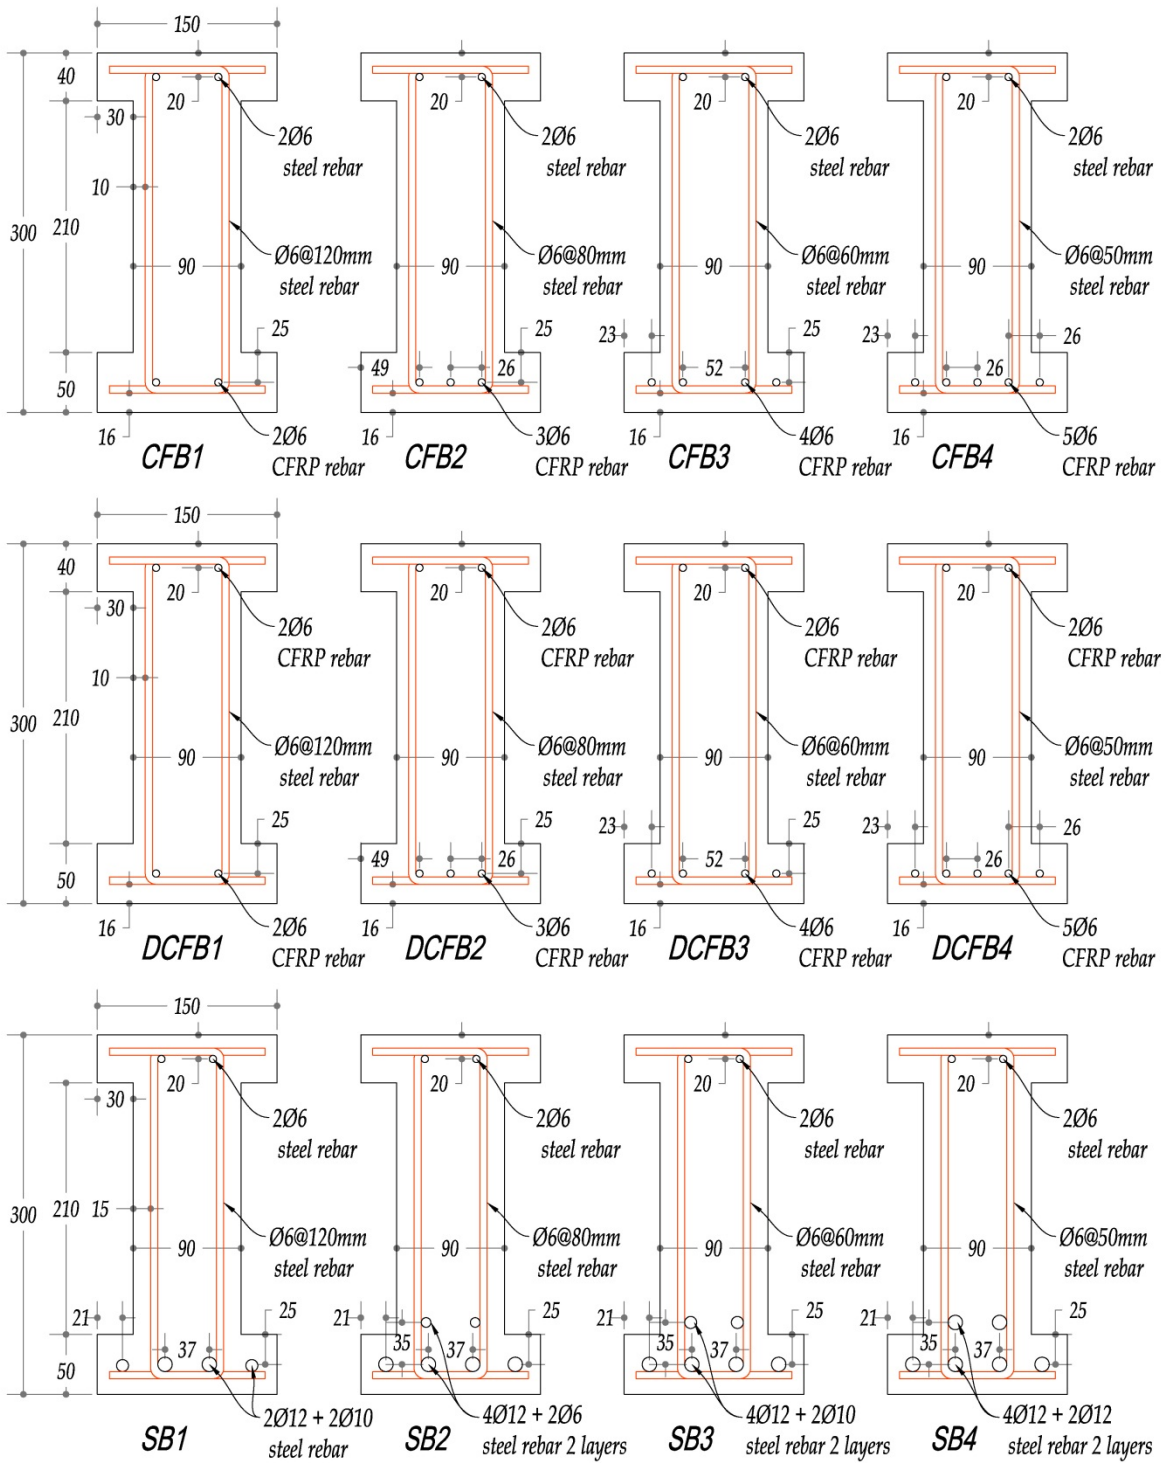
Geometric characteristics of specimen sections (Section at shear span).
